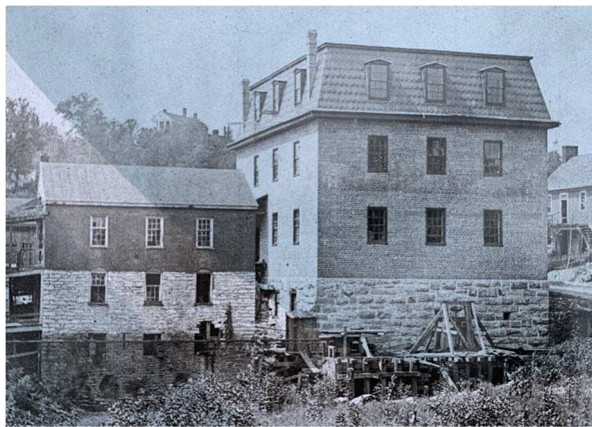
The Mill building foundation wall is seen to extend above the grade of the roadway
